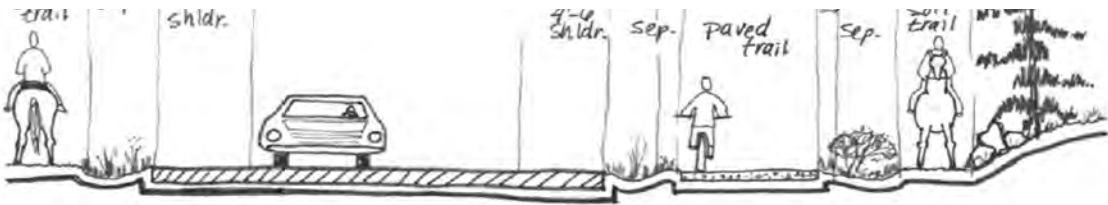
Typical cross section of roadway corridor that accomodates multiple modes (Sites Southwest Ltd.)
